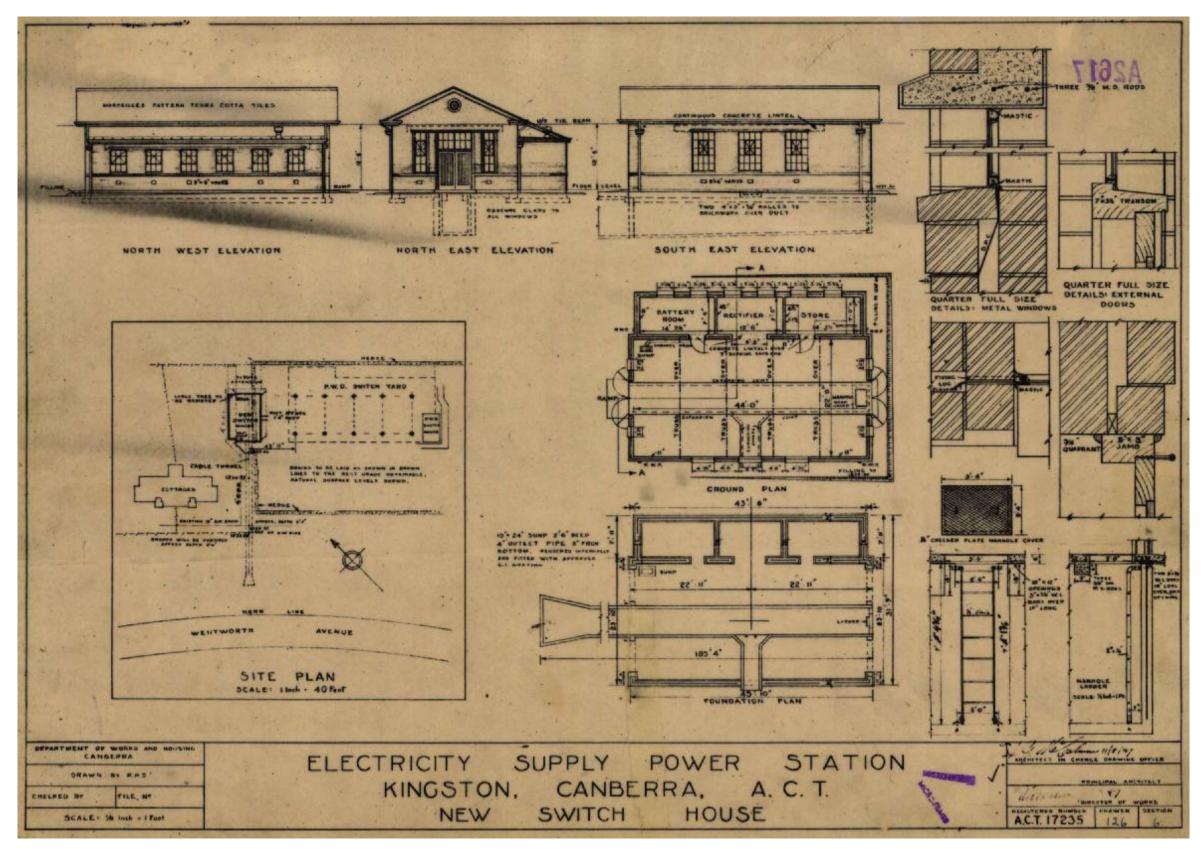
Plans, elevations and details: 'Electricity Supply Power Station, Kingston, Canberra, ACT, New Switch House,' Department of Works and Housing, Canberra, 11 August 1947. Source: National Archives of Australia.
